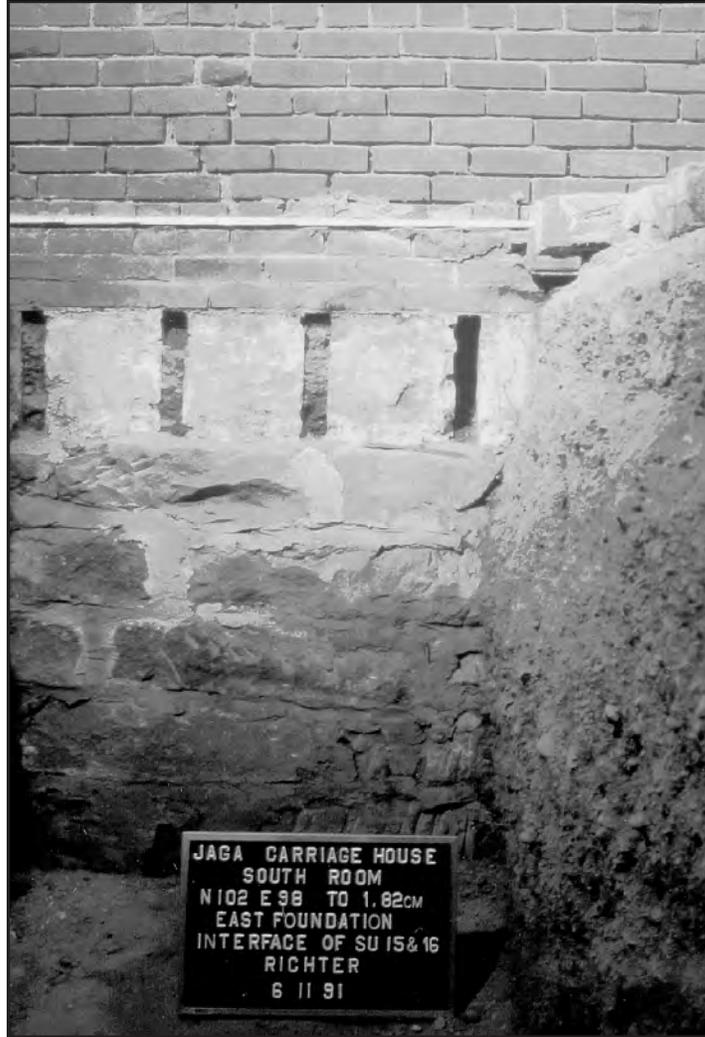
Juncture of basement foundation and brick wall separating Carriage House from the Gas Holder.
